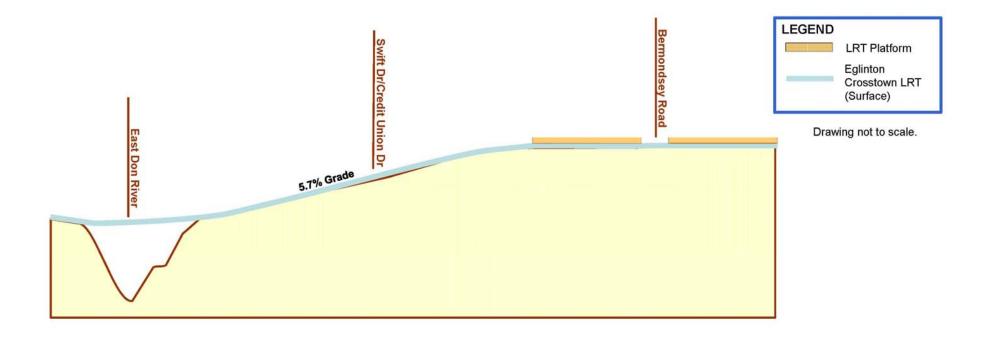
Cross-Section Showing Potential LRT Stop at Swift/ Credit Union (Not Recommended)
